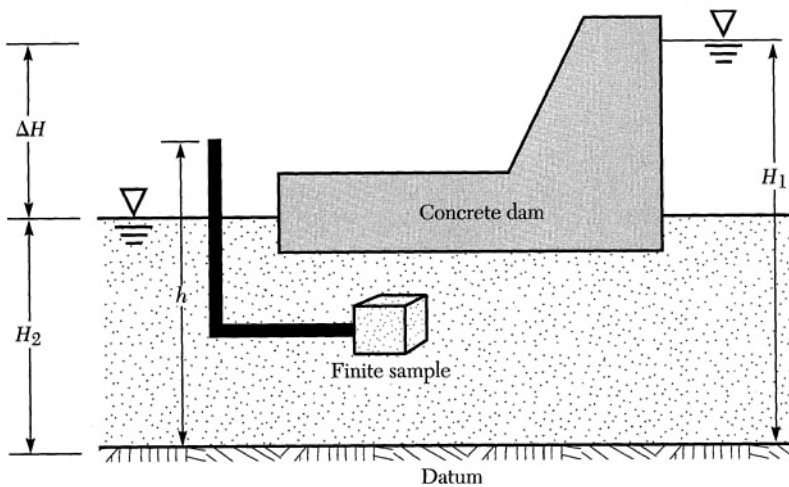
Cross section of a concrete dam showing a cubic soil element.
